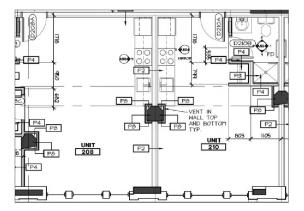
; Floor Plan of Units 208 & 210 Showing Test Wall
